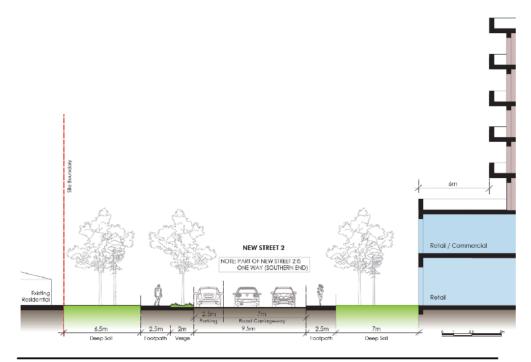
New Street 2 Setbacks – Northern End (Section E-E)
